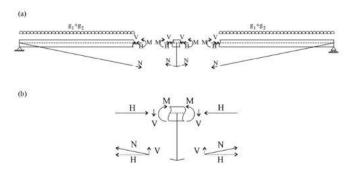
(a) Response mechanisms of externally prestressed concrete deck bridges with cables deviated under the deck under live loads; (b) amplification. Moment resisted by the deck = M (flexural response); moment resisted by the cables = H x (strut height) (axial response); the isostatic moment at mid-span = moment resisted by the deck + moment resisted by the stay cables [2].
